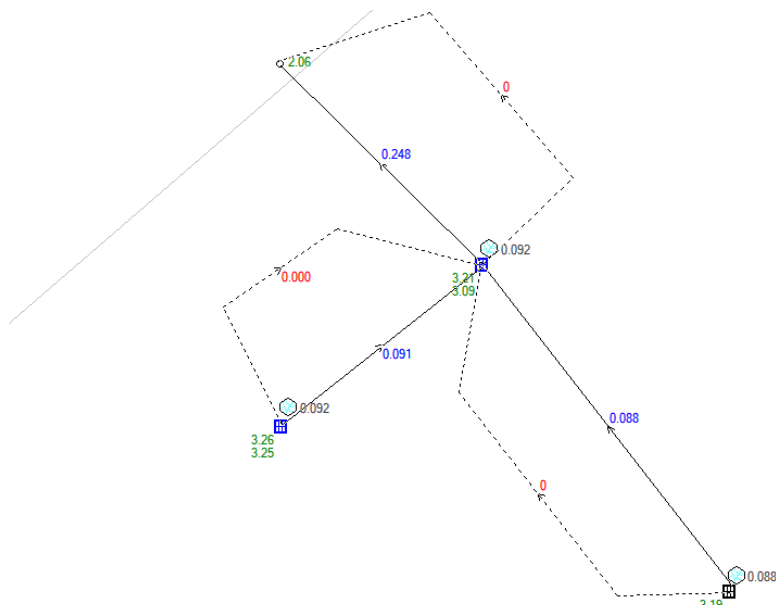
1% AEP Proposed Berth 6 Extension connection to existing cargo shed outfall pipe
